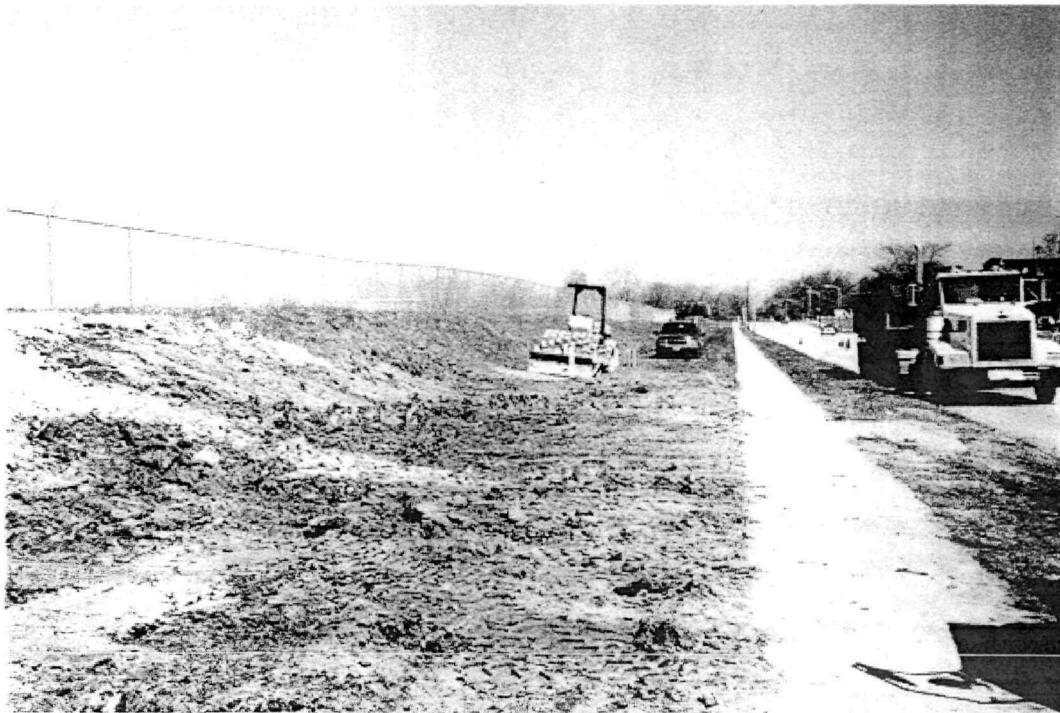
(Facing north). The final lift of clay was placed across the entire area of repair and compacted. Rough grading was made in preparation for placement of topsoil.
